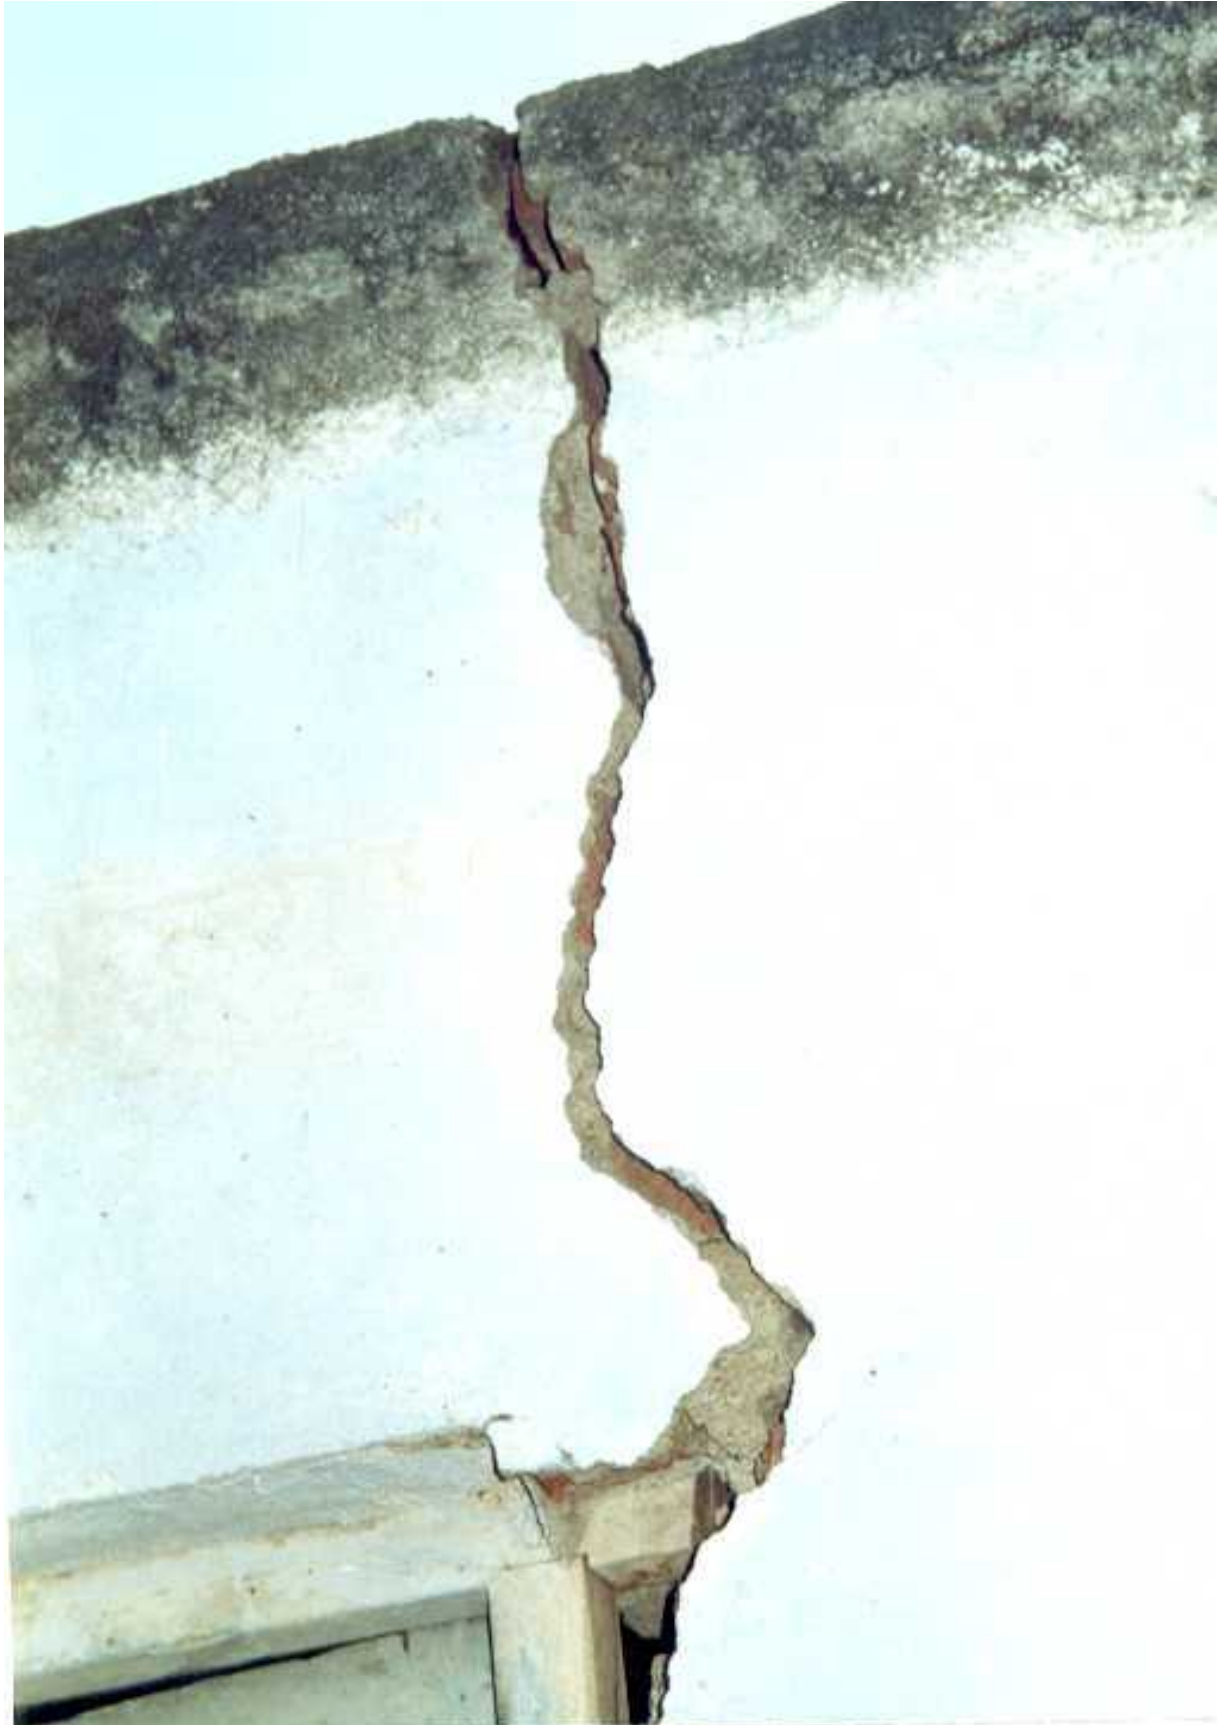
C: Typical Earthquake Damage - Wall Cracking above the Door Opening (1993 Killari earthquake)
